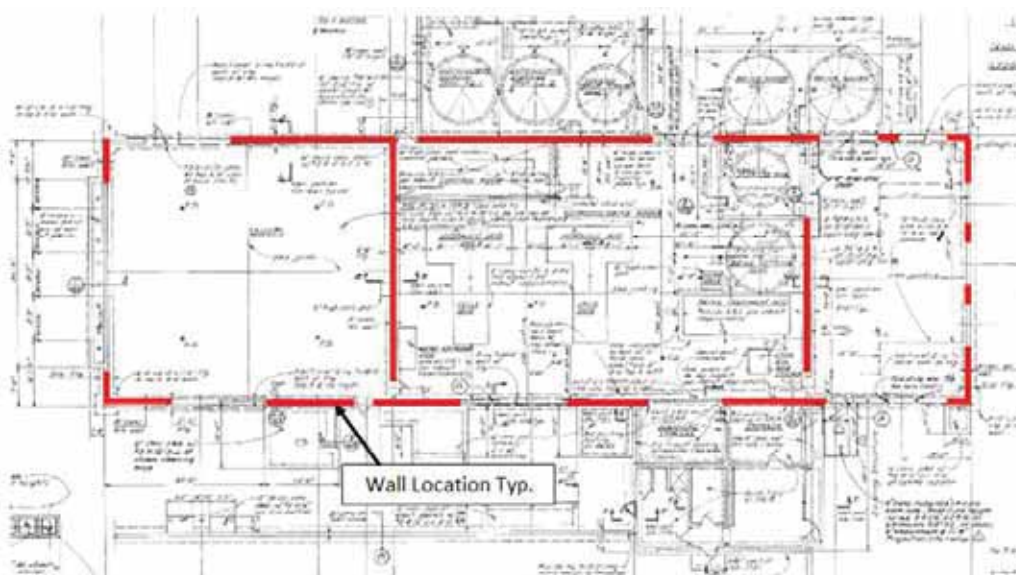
FMC Maintenance Building Reinforced Masonry Wall Locations
